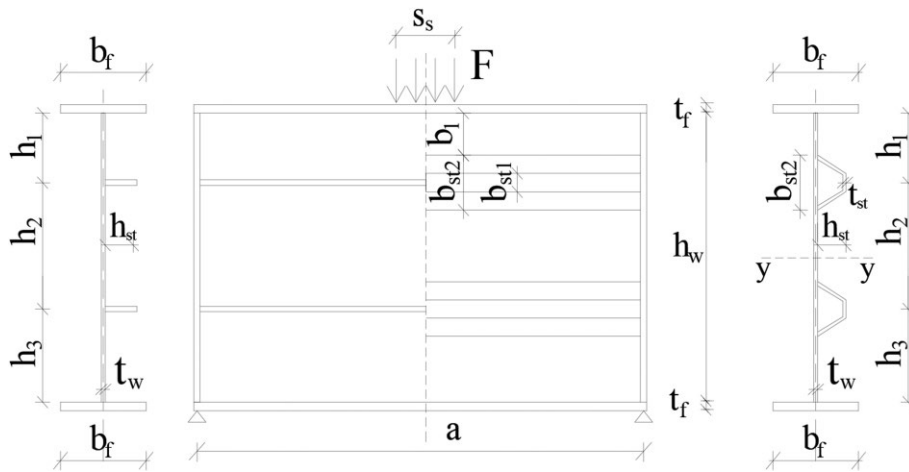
Used geometry and investigated structural layouts with open and closed section stiffeners
